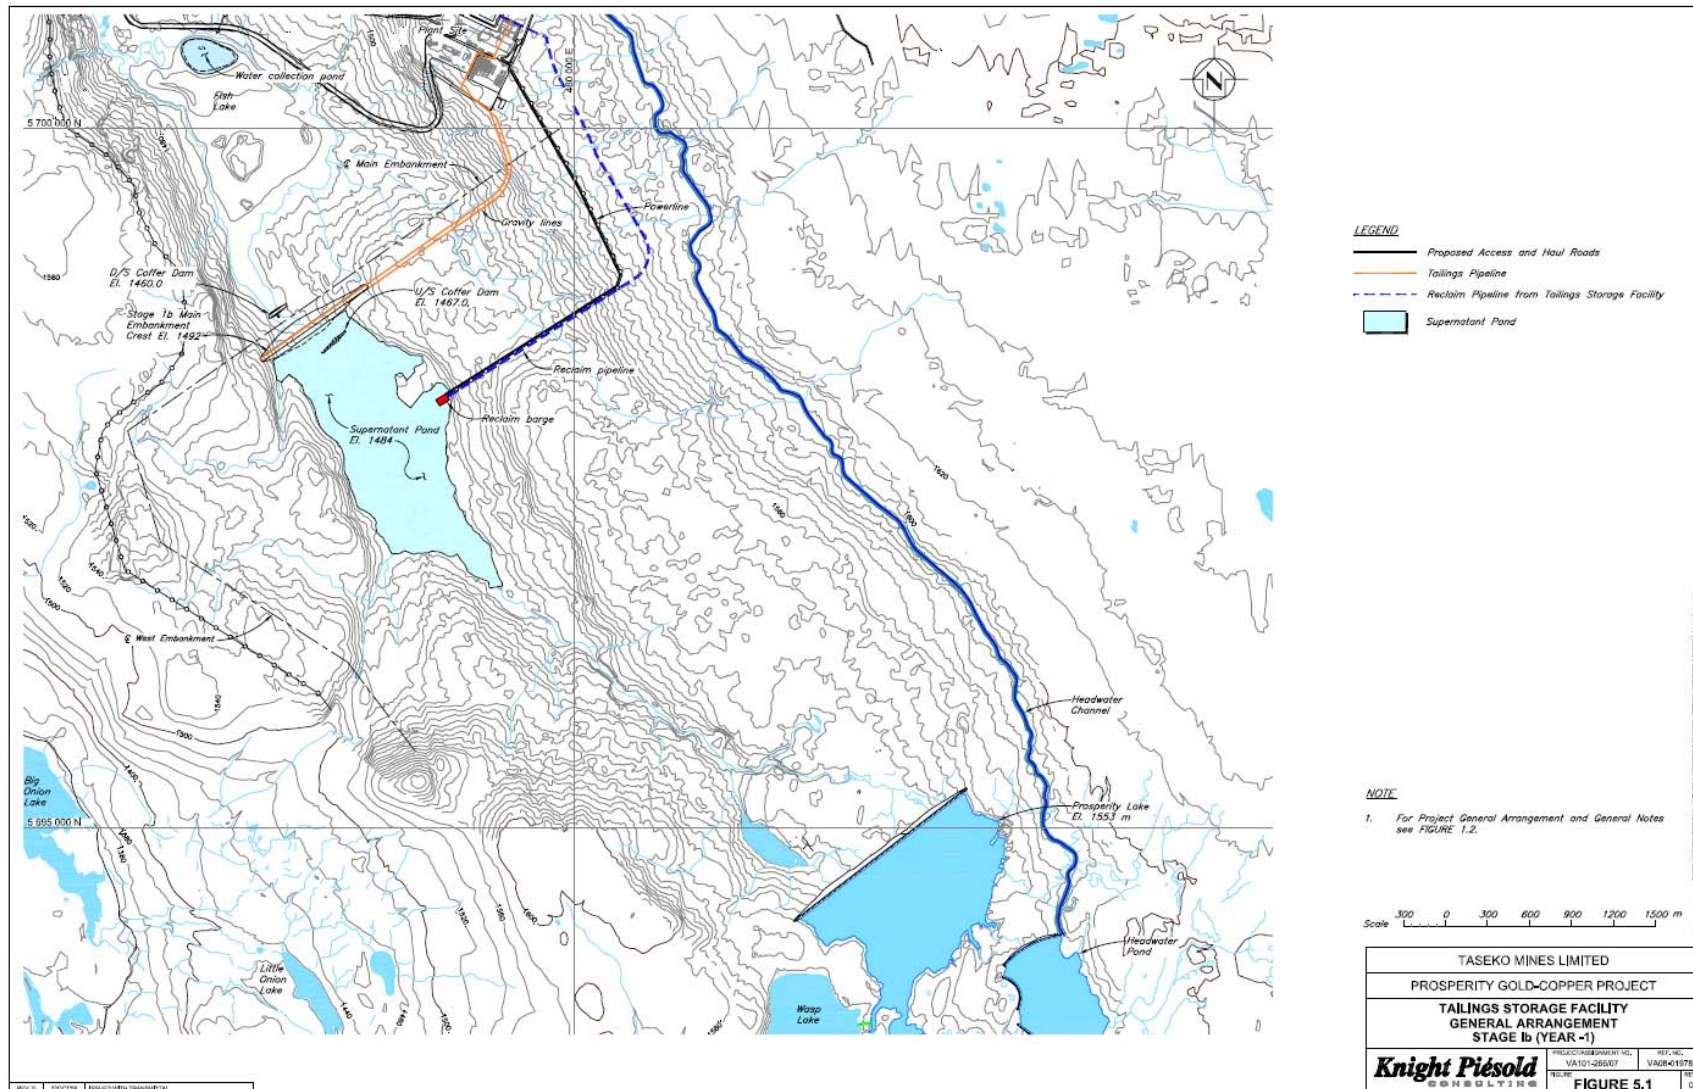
Tailings Storage Facility General Arrangement–Stage 1b (Year-1)
